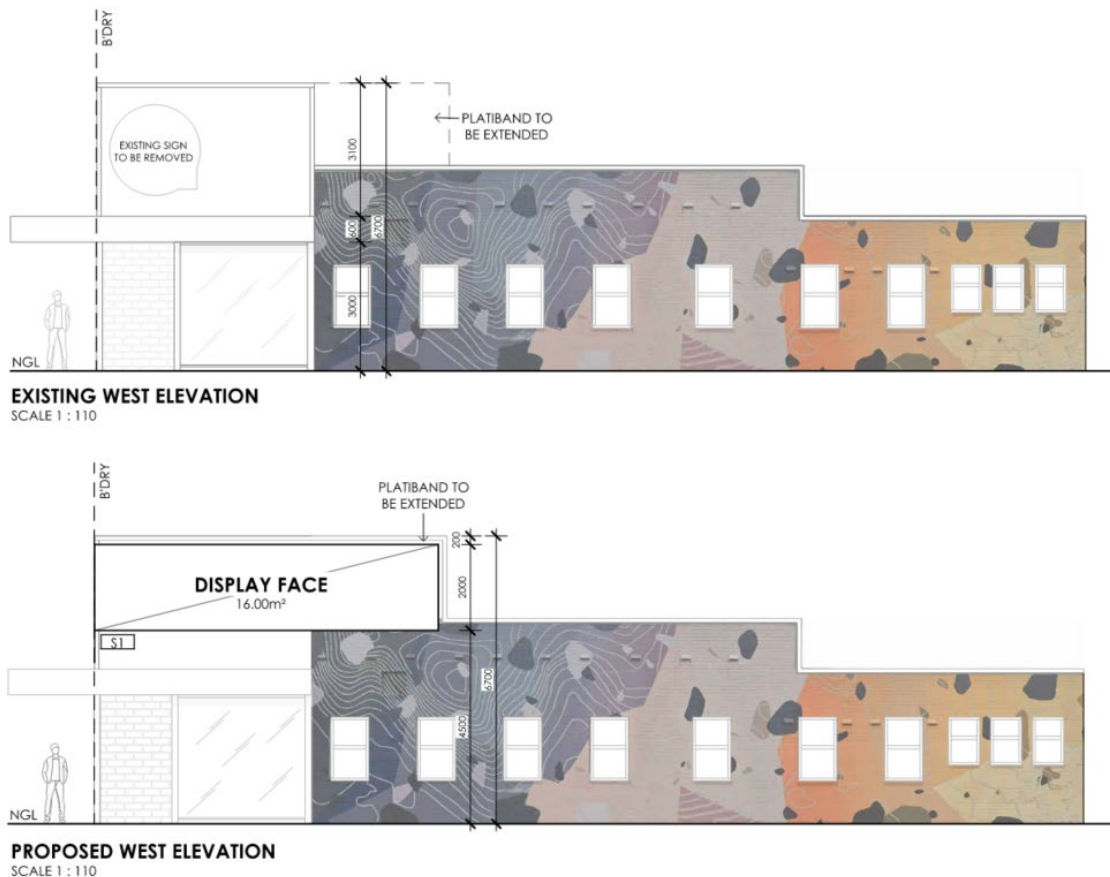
The existing and proposed west elevation, extracted from the amended plans.
